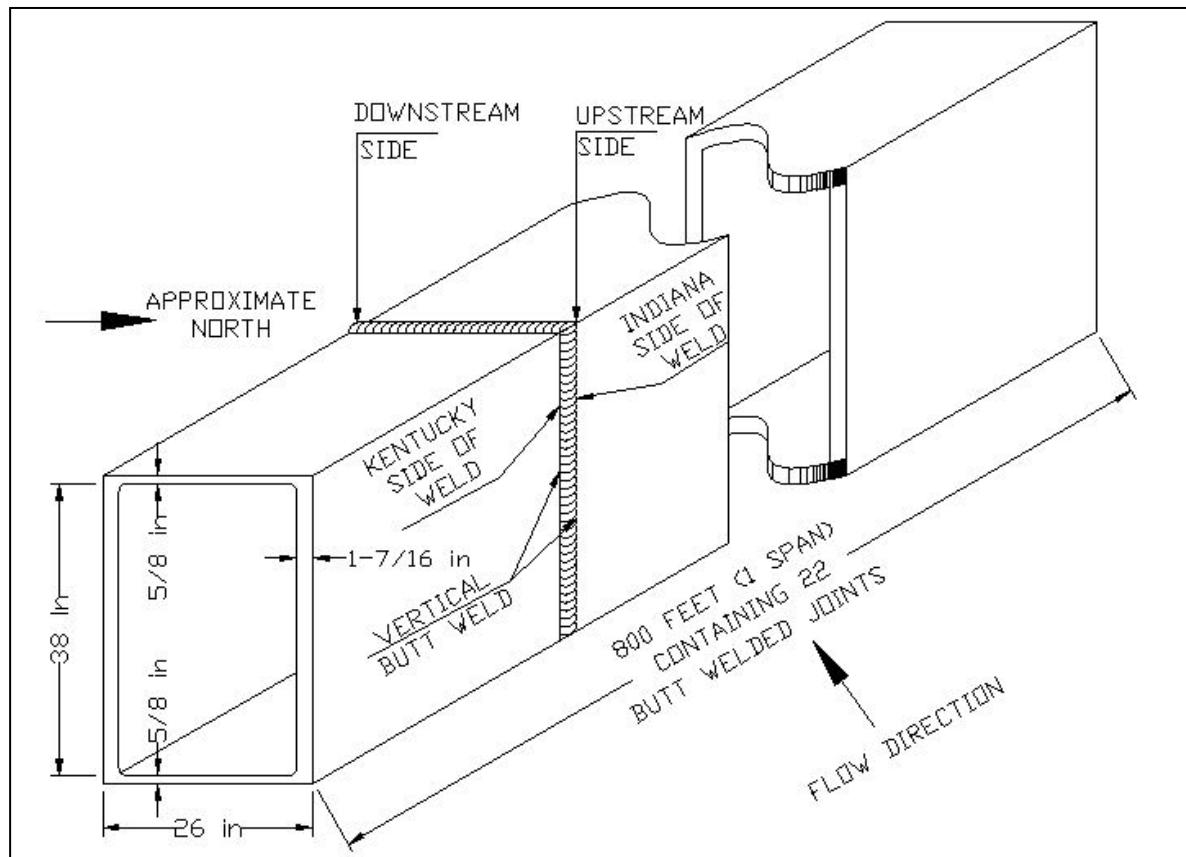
Illustration of a butt welded joint on a tie girder box
